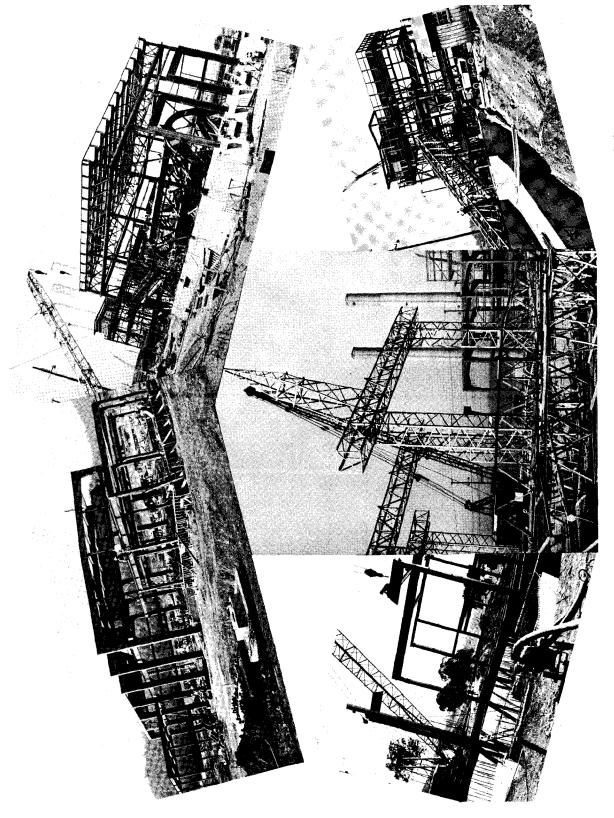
Erection of steel structures other than the powerhouse was done with crawler crane as on, left to right from top, the utility building, hopper building No. 1, control building, switchyard, and the coal conveyor and crusher building.
